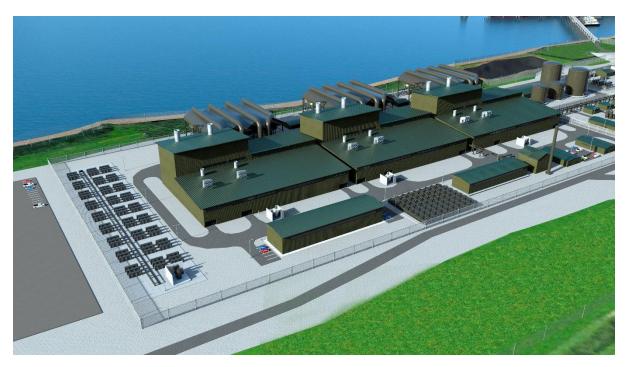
Proposed Power Plant at the Proposed Development Site
